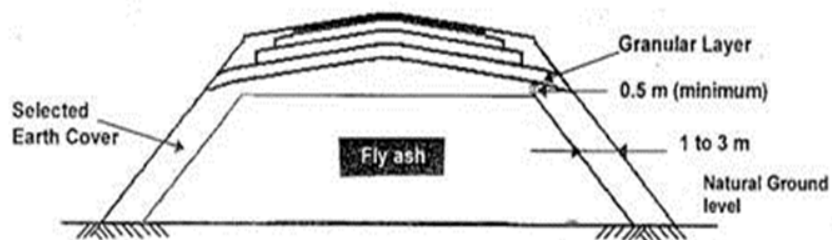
Typical Cross-Section of Embankment with Core of Fly Ash
